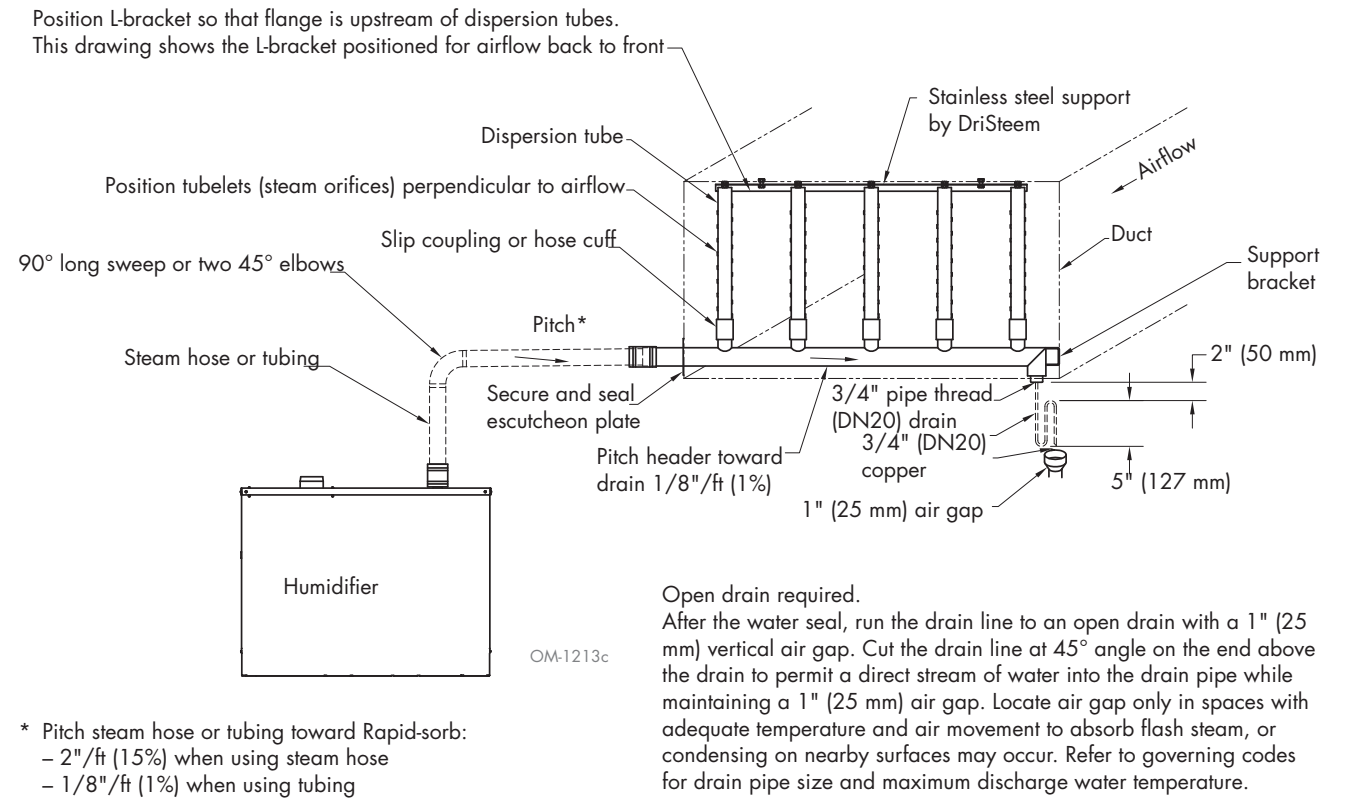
RAPID-SORB WITH HEADER OUTSIDE THE DUCT, HORIZONTAL AIRFLOW
